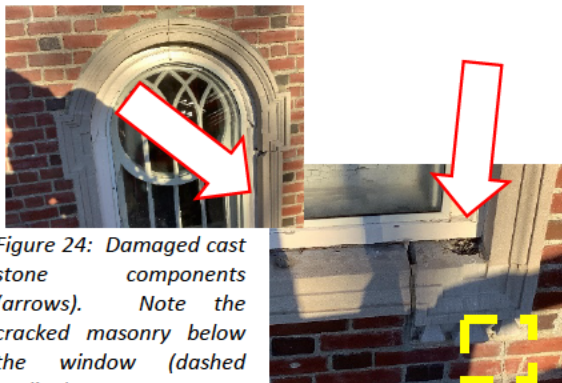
Damaged cast stone components (arrows). Note the cracked masonry below the window (dashed outline).
